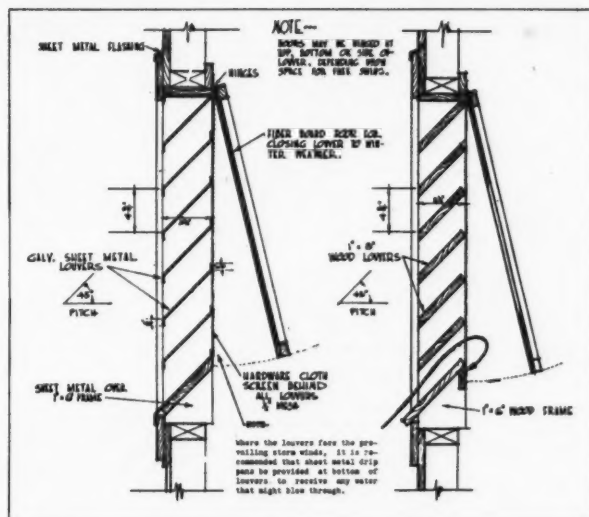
Suggested construction details for louvred openings, showing flashing and door to be closed in winter. Suggested by American Blower Co.
